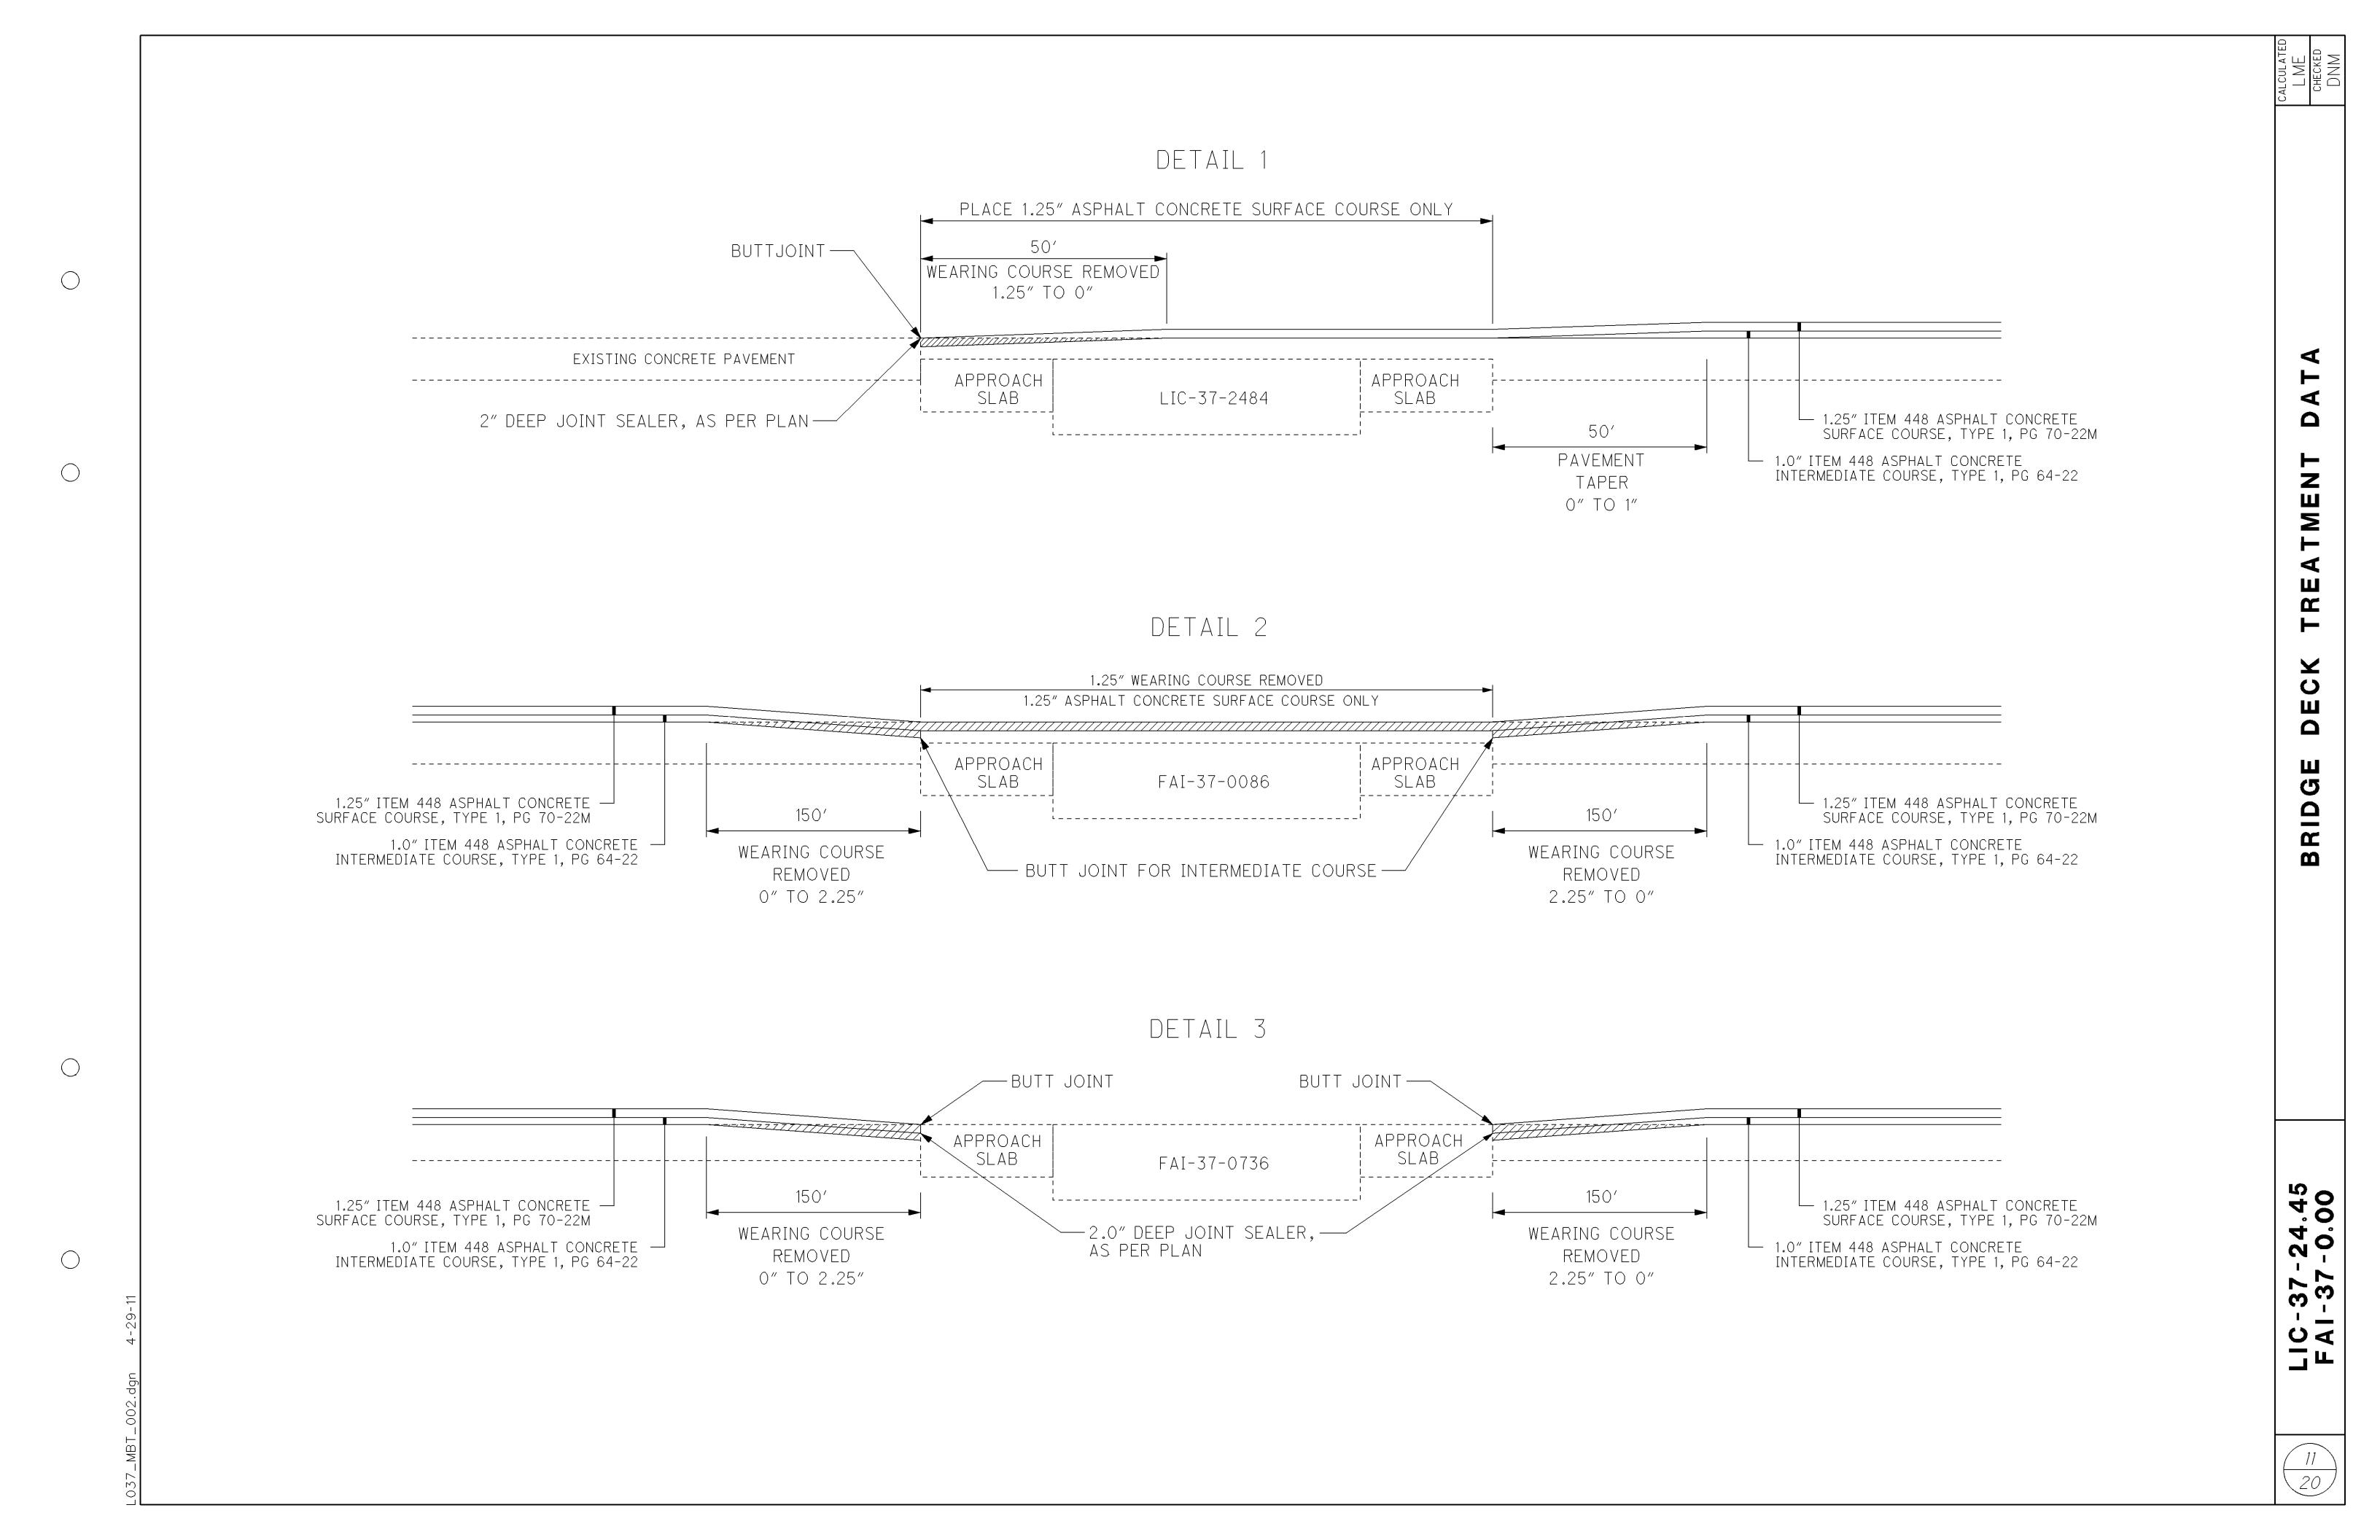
FAI-37-0086 - MILL & FILL, 1.25" ASPHALT CONCRETE SURFACE COURSE
